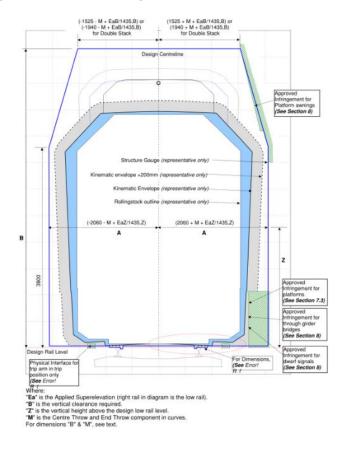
Structure Gauge Tolerances for Overhead Structures
